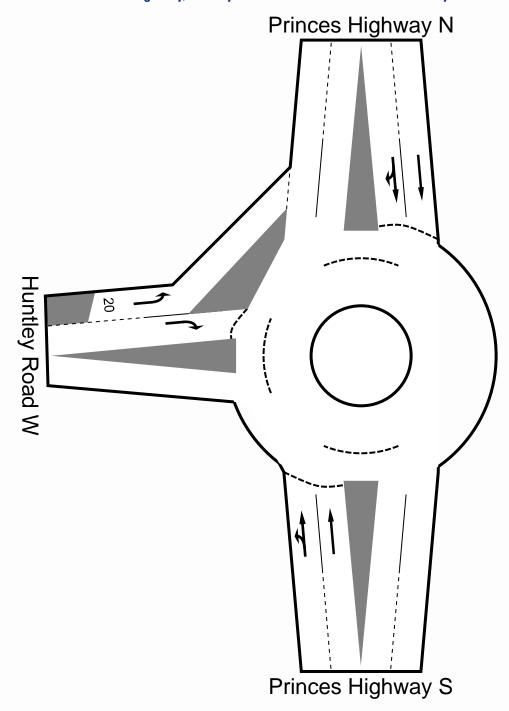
Princes Highway/Huntley Road 2008 Intersection Layout
